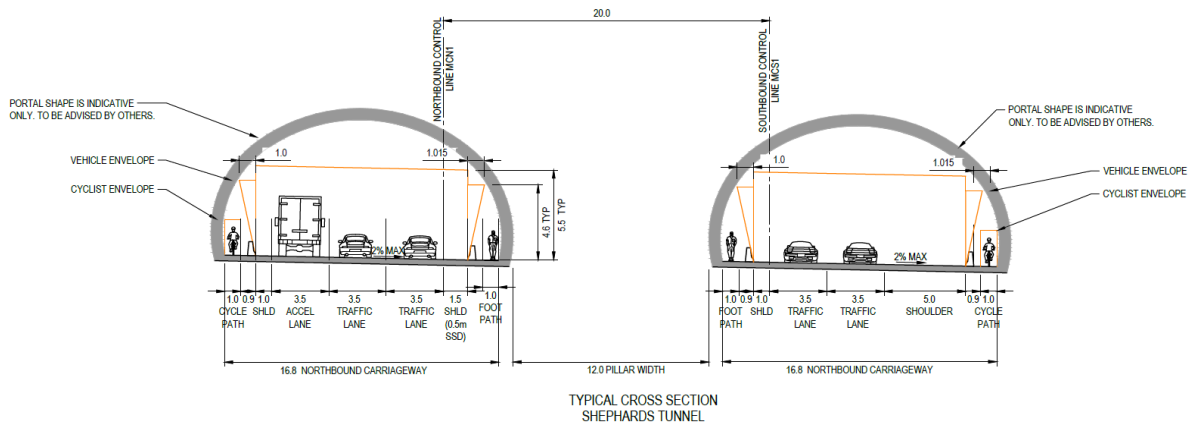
Tunnel cross section for the Shephards Lane Tunnel (subject to detailed design)
